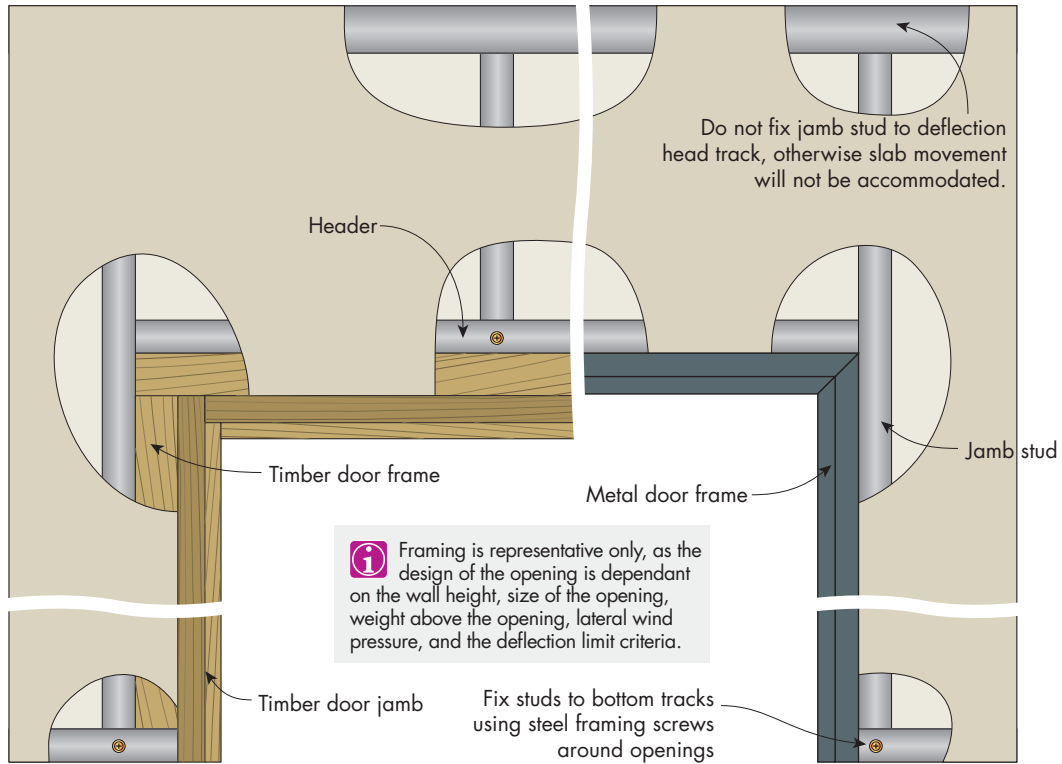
Base Track Connection BC2 for Door Opening
